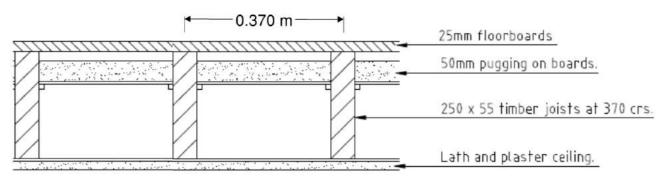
Typical single boarded floor build-up from Chamberlain Consulting Engineers' report
